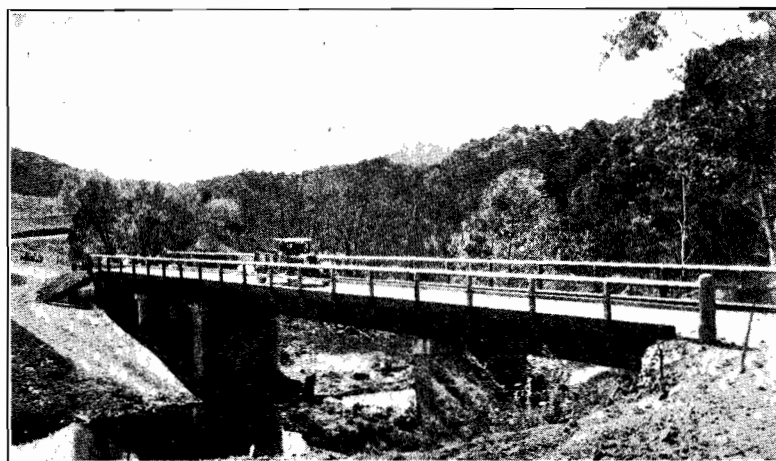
Showing new bridge on the Deddick River Road at Cabanandra.
